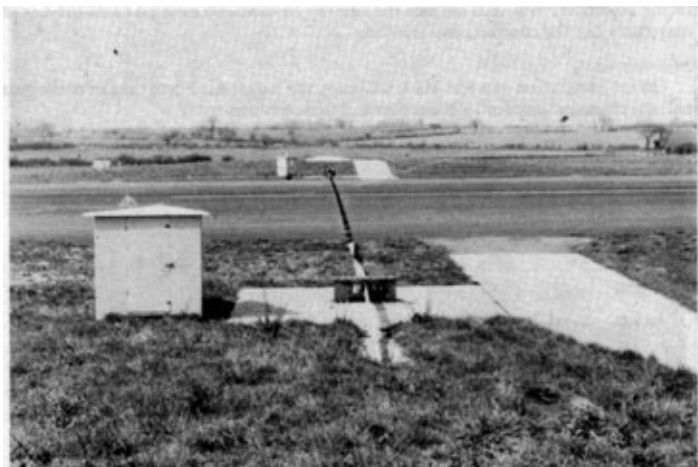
One of the early installations with buried "mounded" EAU's and fixed runway edge sheaves. This is at RAF WATTISHAM.
